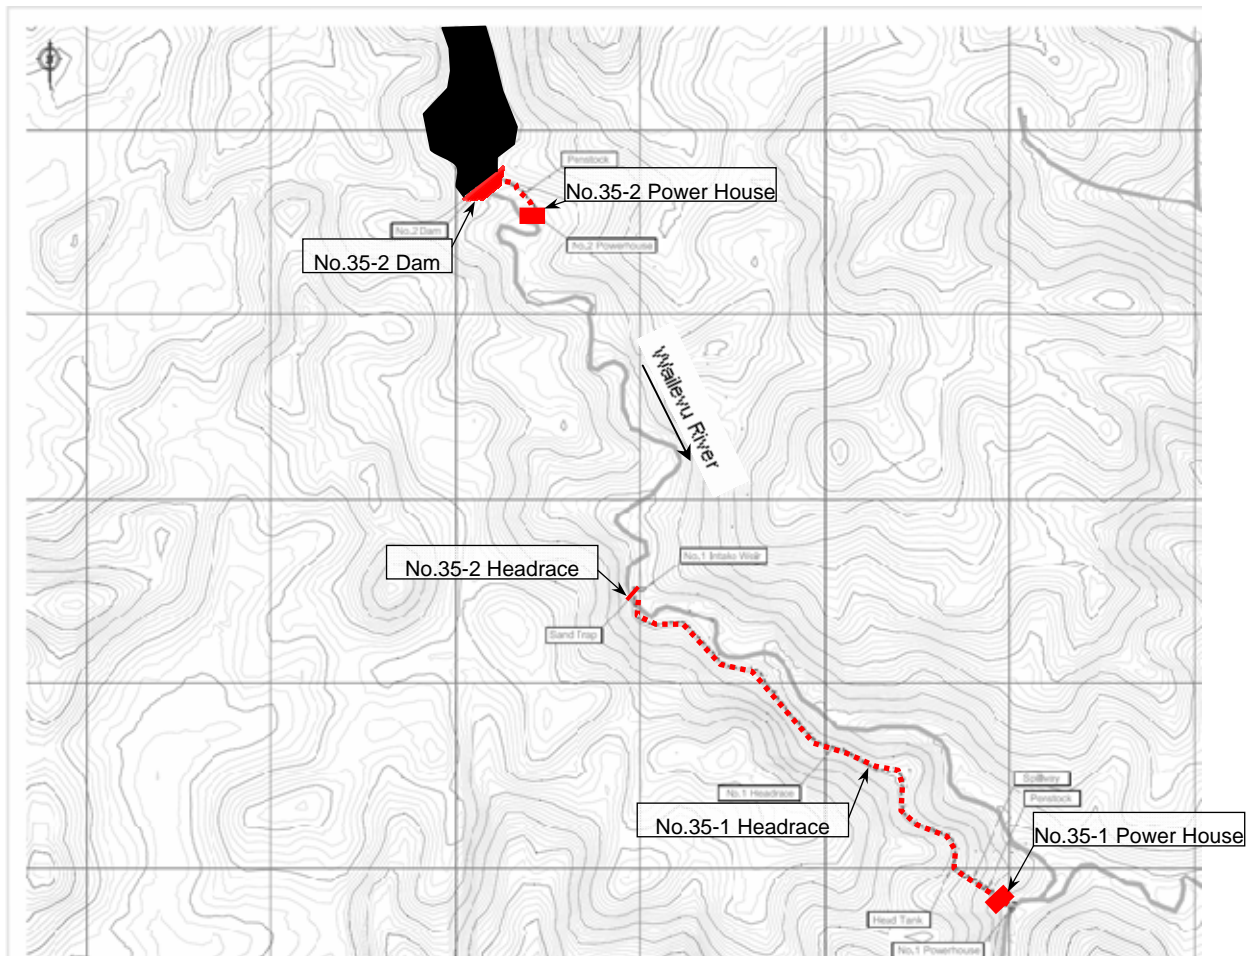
General Layout Plan for No.35 Wailevu Scheme
